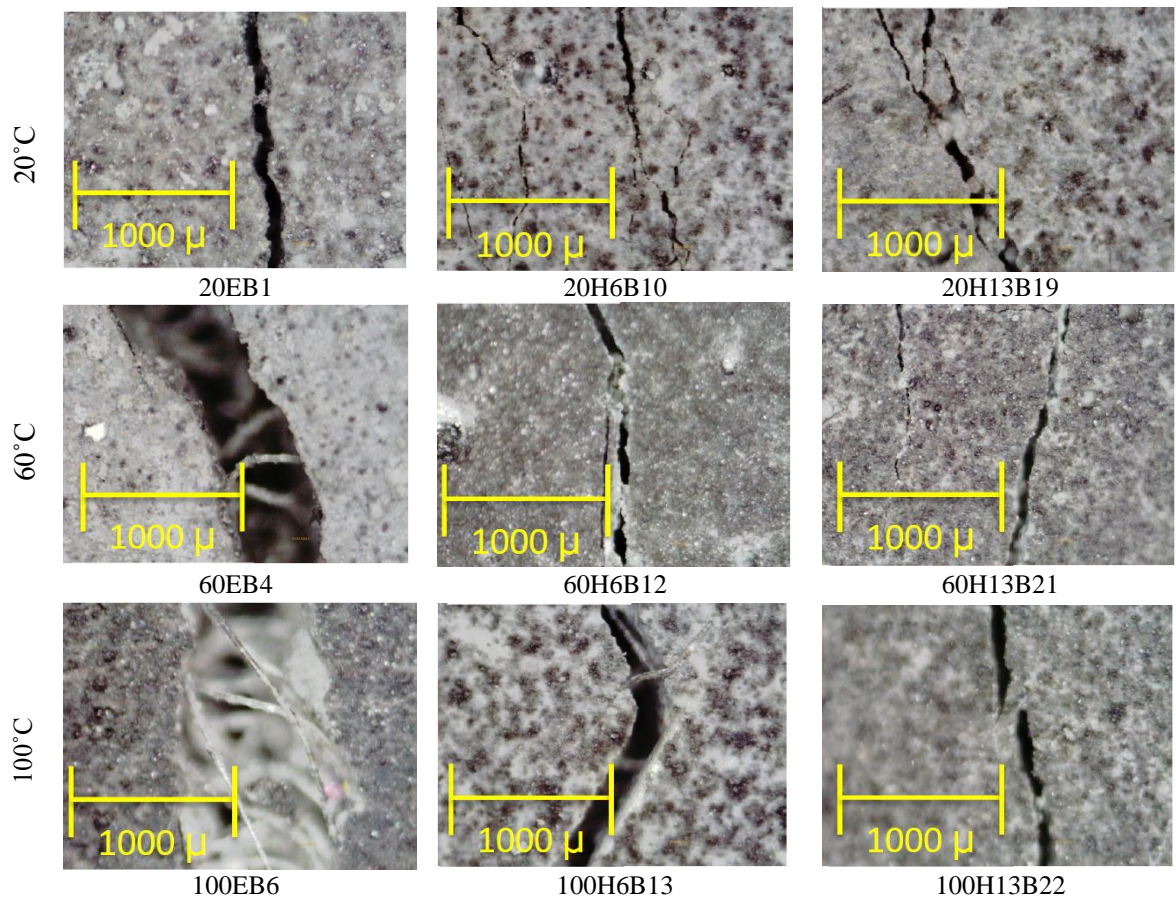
Typical crack width at bending test when multiple crack distribution happened in specimens
